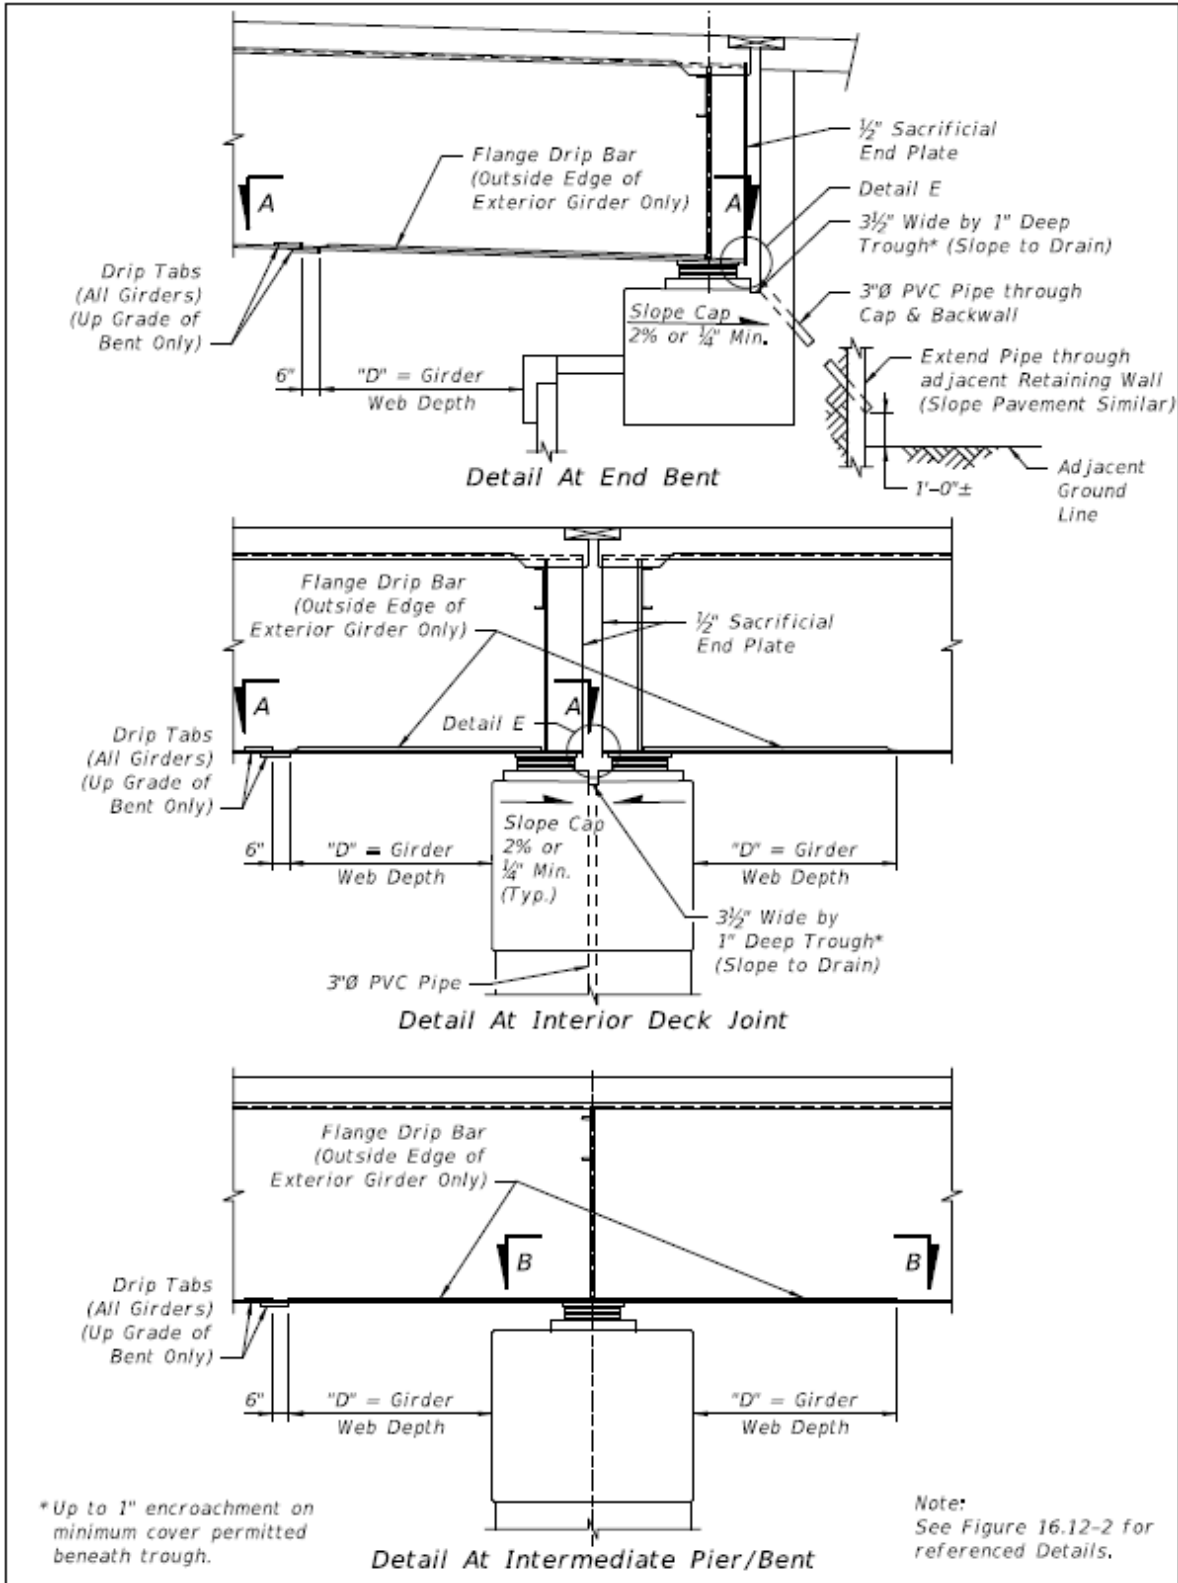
Weathering Steel I-Girder Details (1 of 2)
